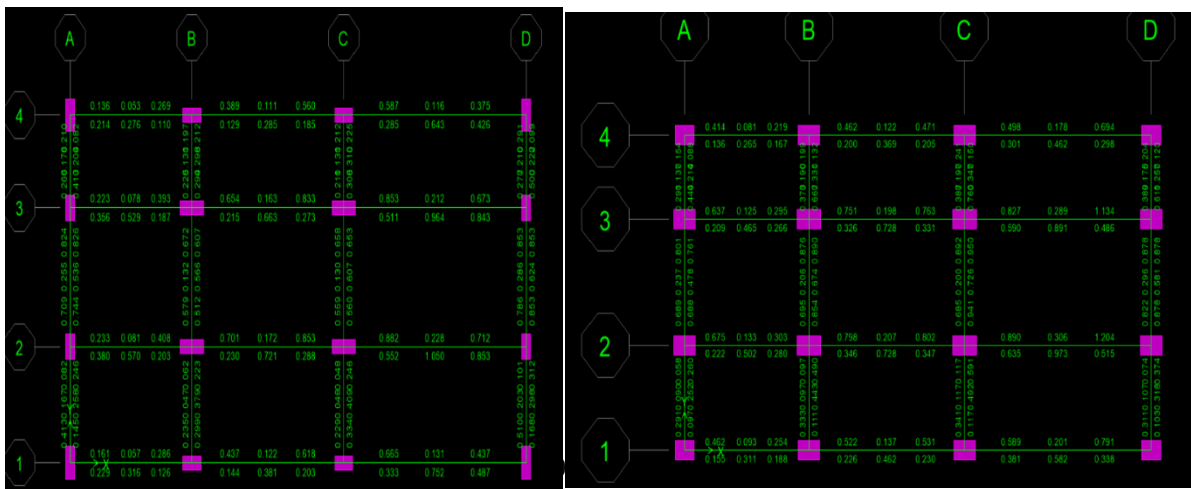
Plan View of First Floor at Six(left) & Ten(right) Storied Building
